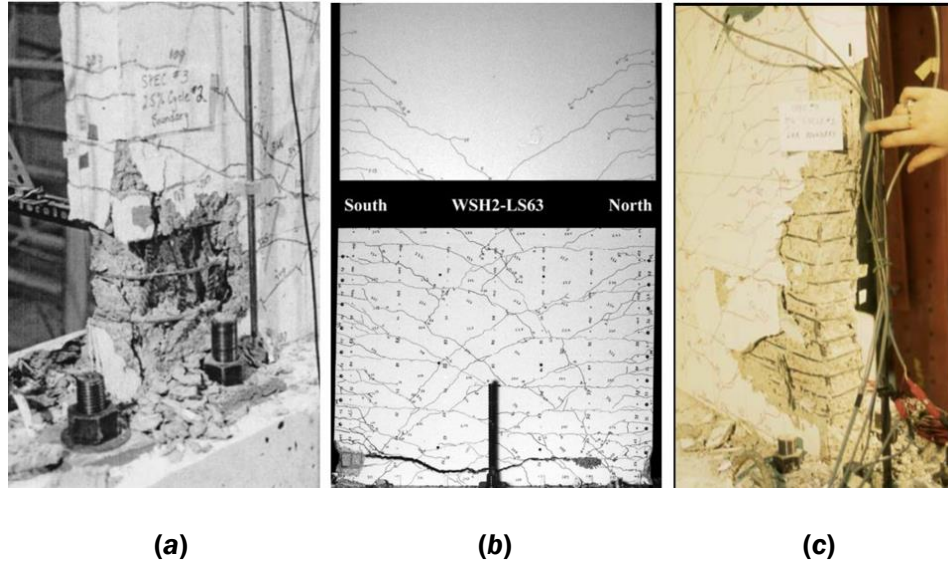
Wall flexural failure modes: (a) bar buckling and concrete crushing (Thomsen and Wallace, 1995), (b) bar fracture (Dazio et al., 2009), and (c) lateral instability (Thomsen and Wallace, 1995).
